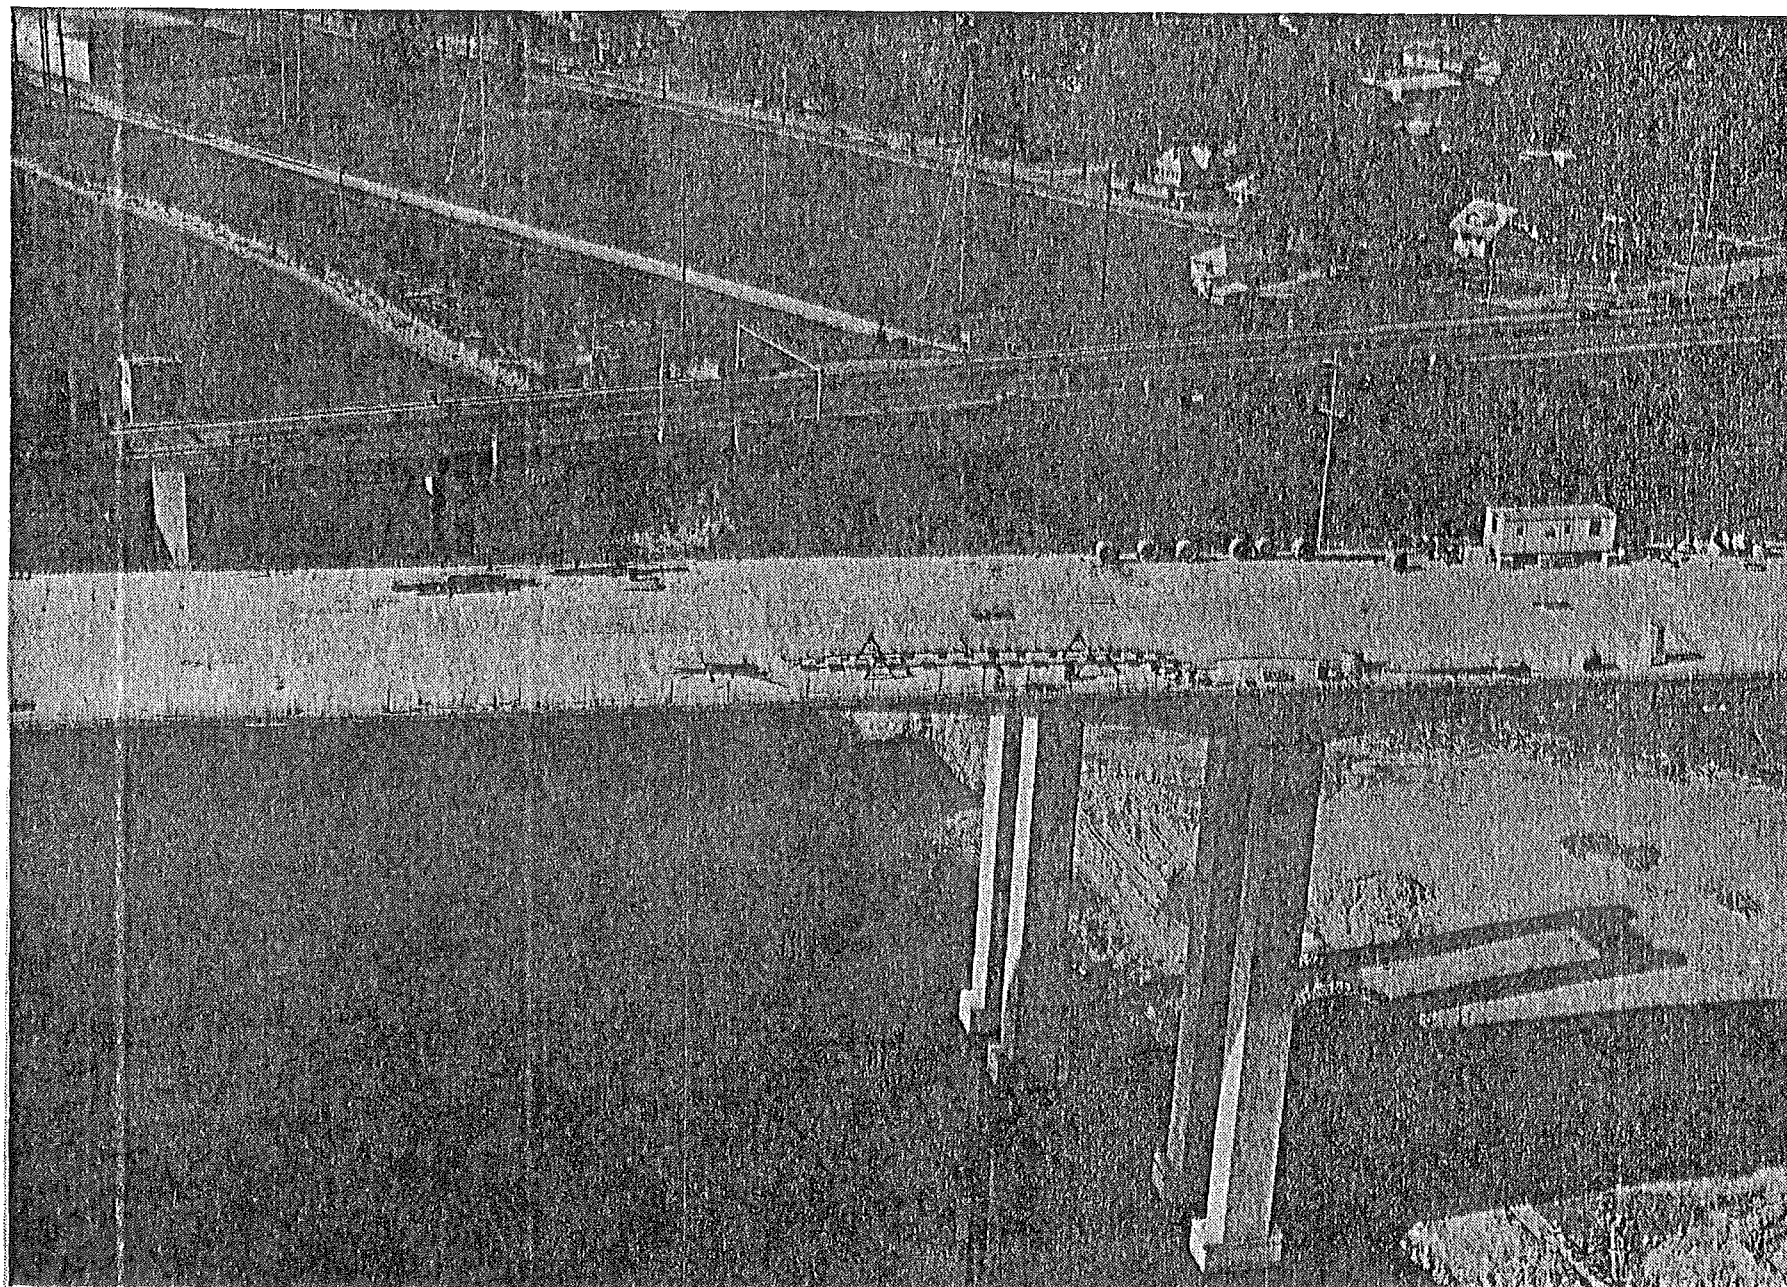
Aerial view of Span 13, Pier 13N and Span 14
